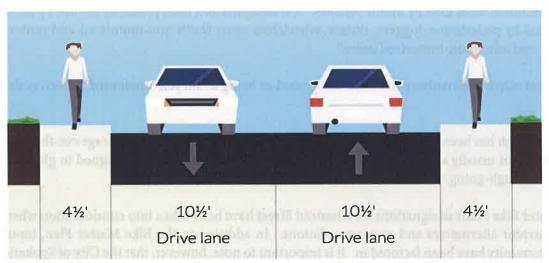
Cross section of N Chestnut St at Dutch Jake's Park, which is representative of the street dimensions between W Bridge Ave and W Boone Ave. ROW = 30'.
